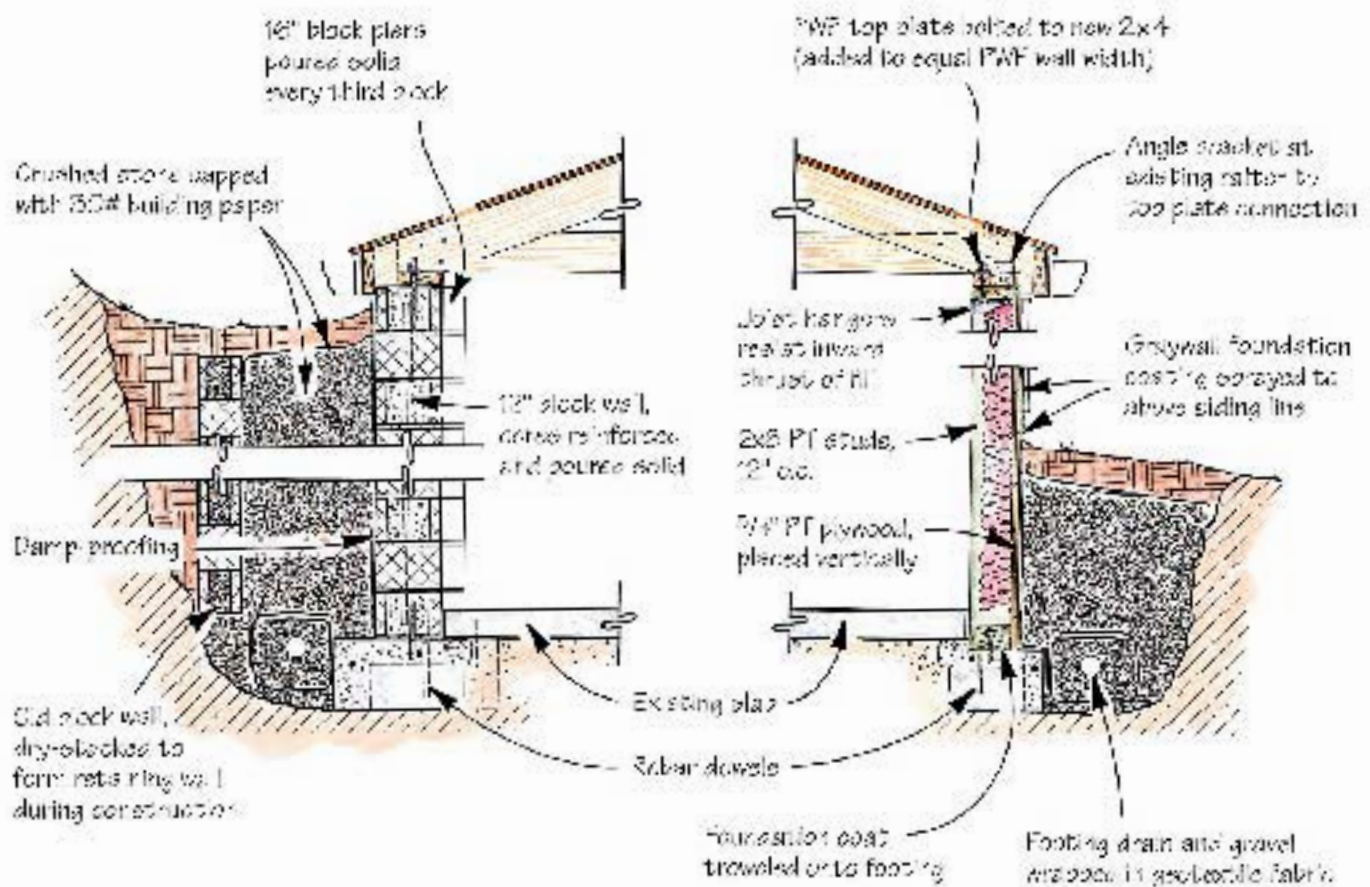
Blocks from the demolished south wall, at left, were restacked to form a makeshift retaining wall several feet away from the building, providing working room and keeping soil from contaminating the drain tile. The new 12-inch block wall was reinforced with a series of 16x16-inch chimney block buttresses. A PT foundation was chosen for the north wall, where there was less soil pressure.
